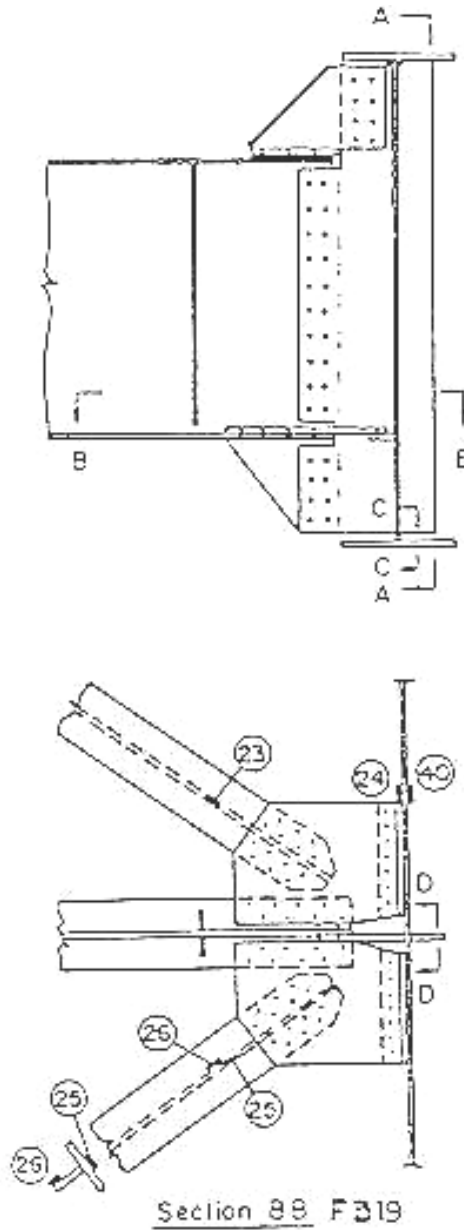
Horizontal attachment plate for lateral bracing members and floor beam bottom flange in the Canoe Creek Bridge (Demers and Fisher, 1990)
